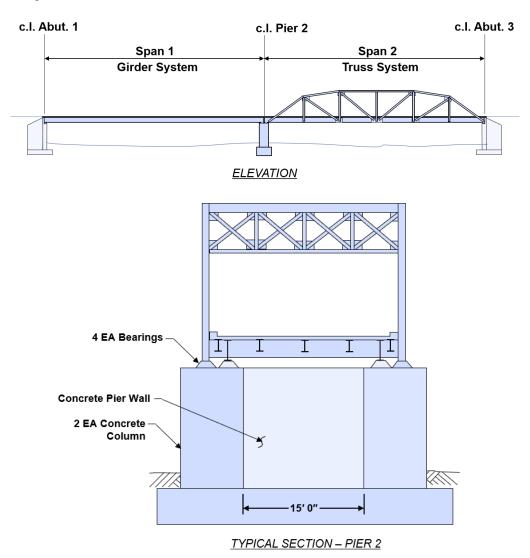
A—Elevation View and Typical Section (Pier 2) for Girder/Truss Bridge with no Pier Cap Example
